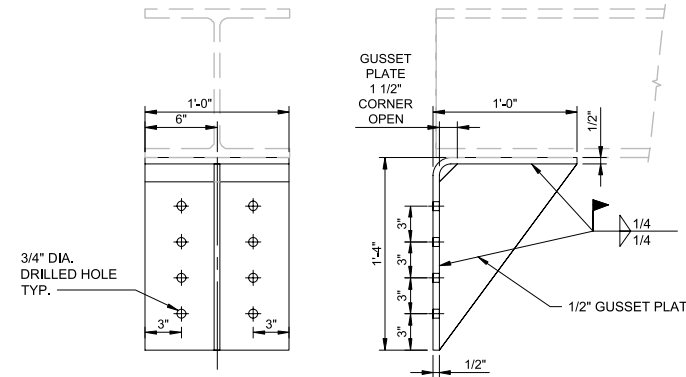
DETAIL - STEEL BEAM TO EXIST CONCRETE SLAB NTS
